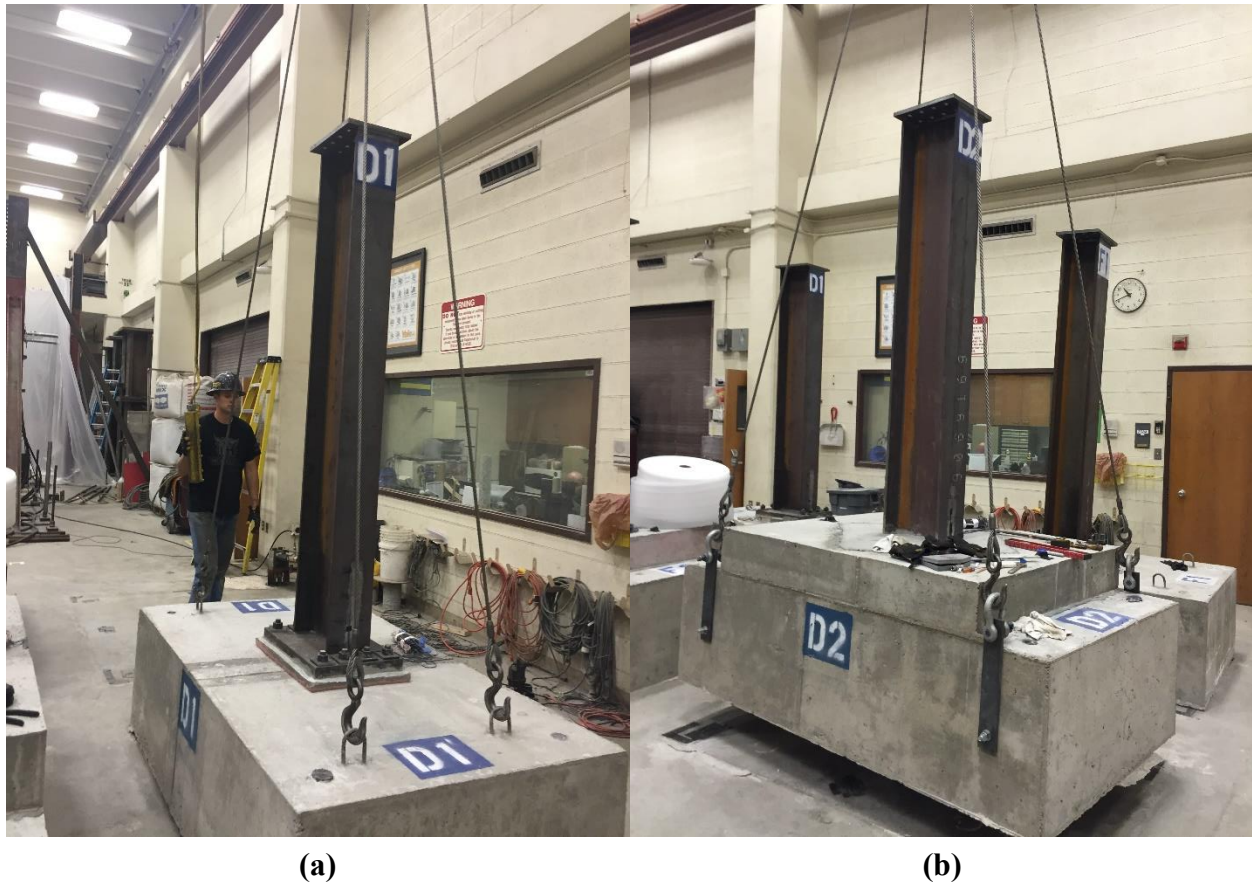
Moving Specimens Using the Lab Overhead Crane Using (a) Original Bent-Rebar Pick Points, and (b) Post-Installed Pick Points
